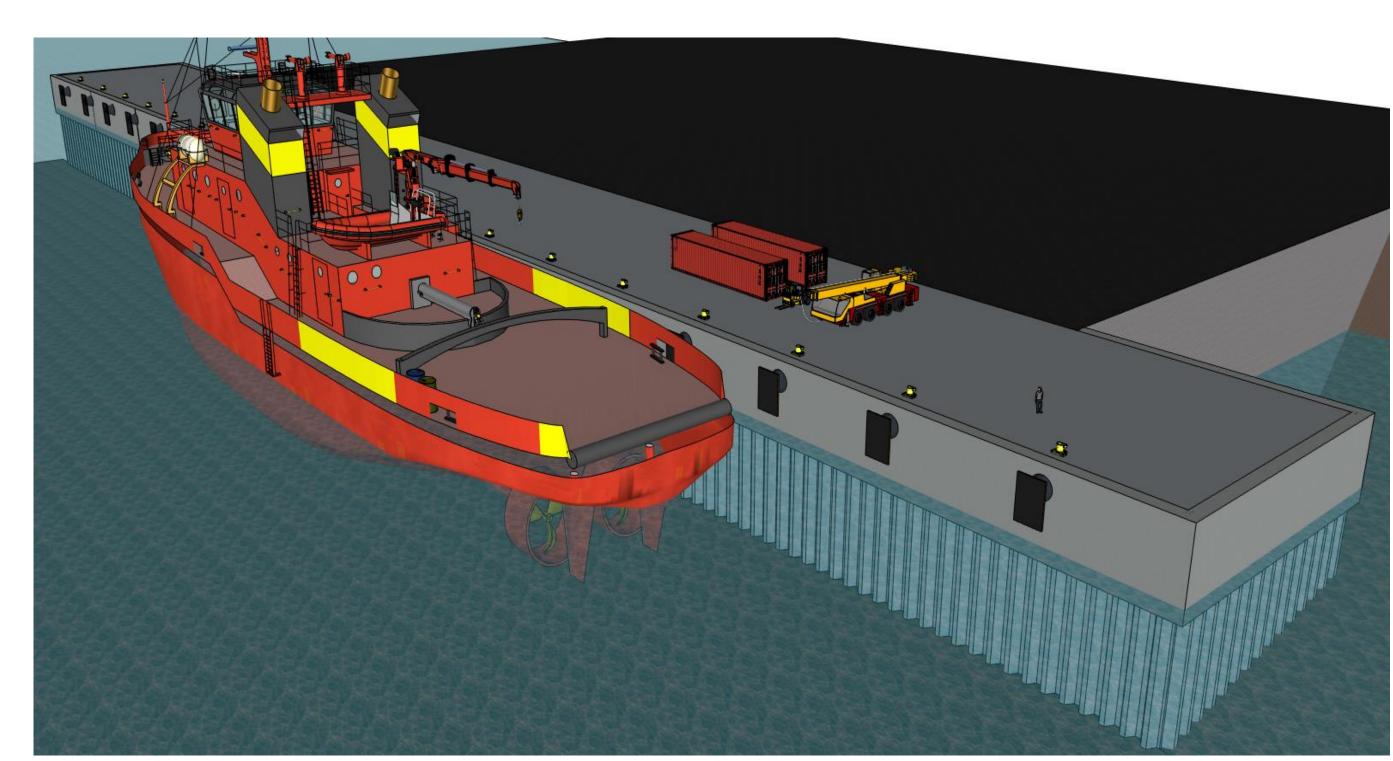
Conceptual drawing of the steel sheet pile bulkhead design
